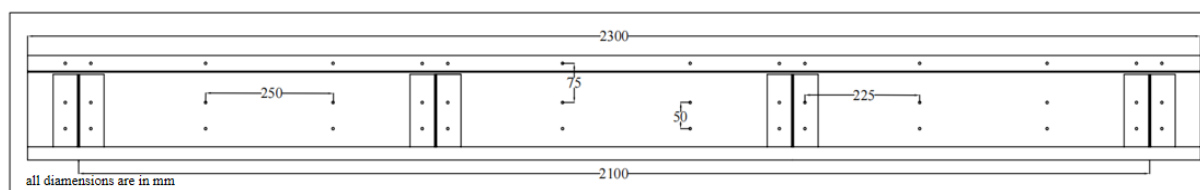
Details of Screw spacing in CFS composite built-up beams.
